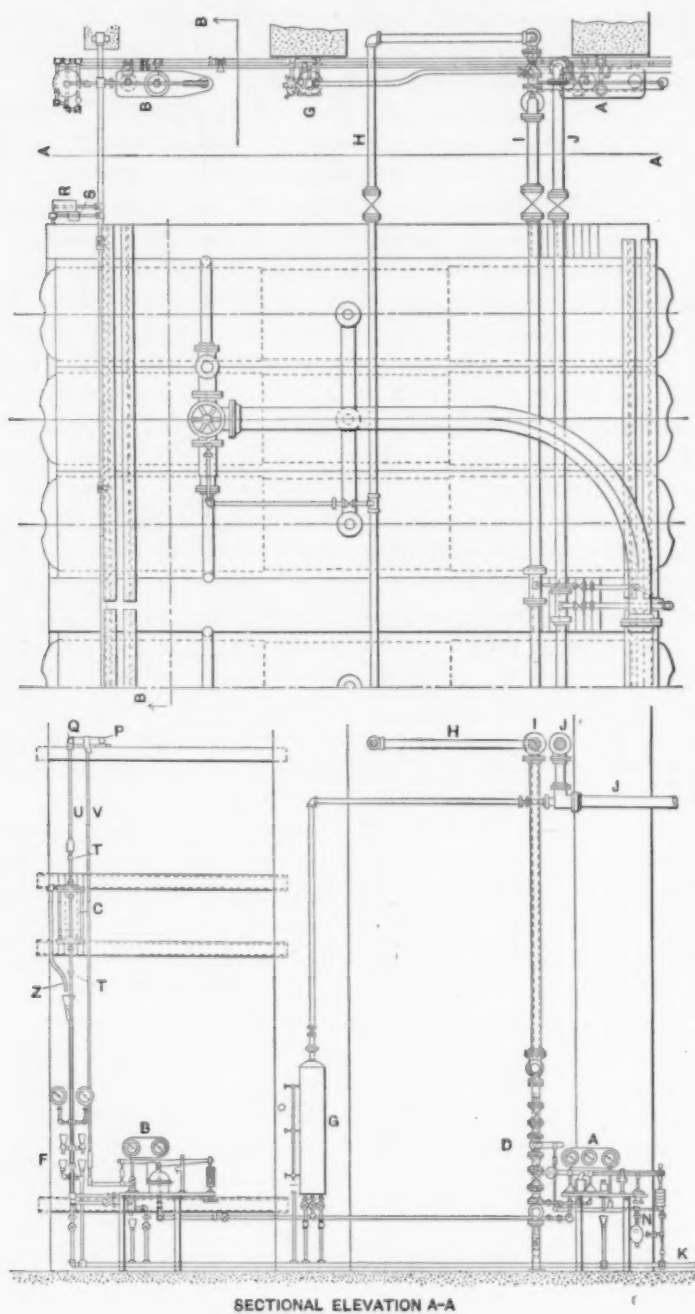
GENERAL ARRANGEMENT OF APPARATUS—SECTIONAL ELEVATION AND PLAN
